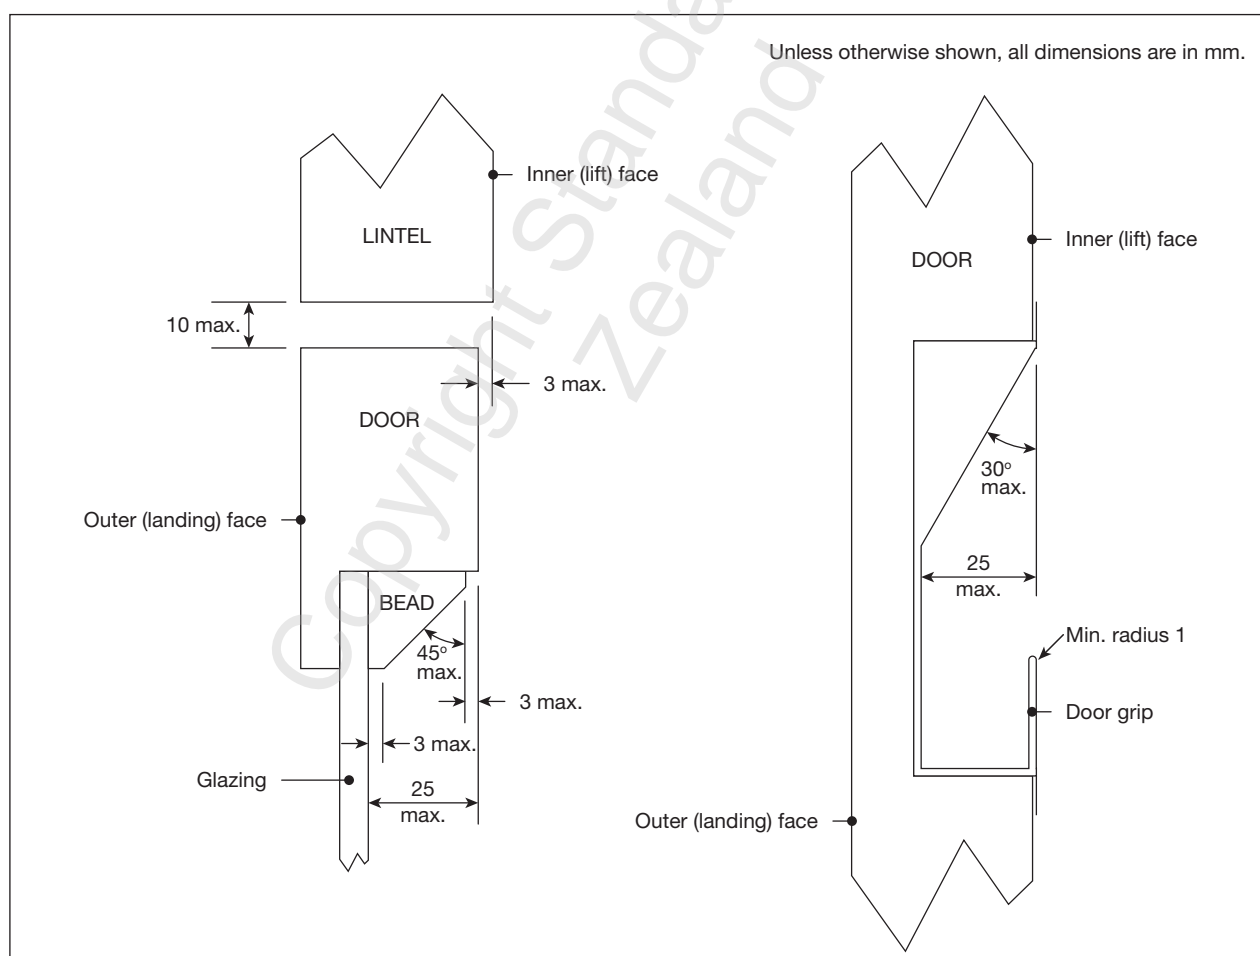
Details of landing door recesses for glazed panel (left) and door grip (right)
